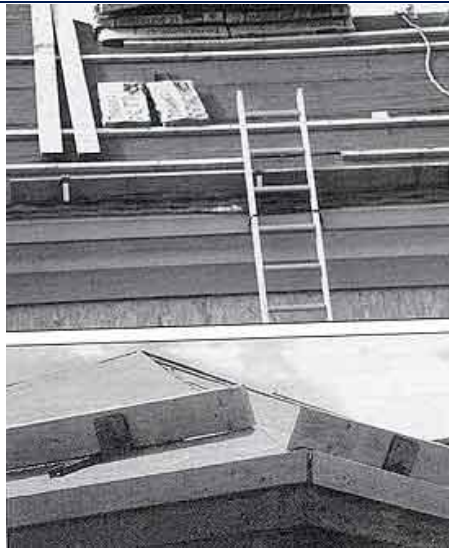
and 15b. These photographs show properly installed slide guards along the roof eave. The slide guard is a roof bracket with a 2x6 at a 90-degree angle.
